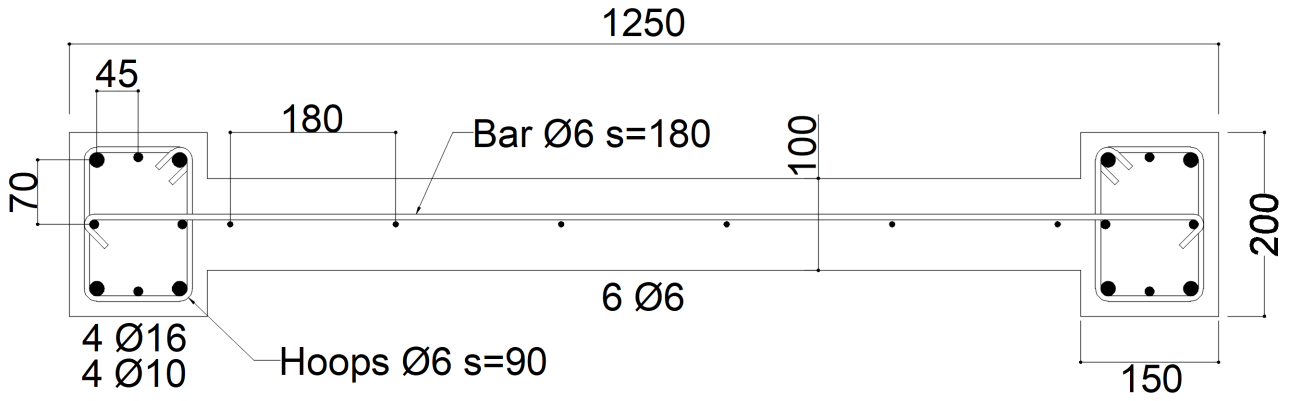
Unit 2.0: Cross section and reinforcement detailing [Unit: *mm*].
